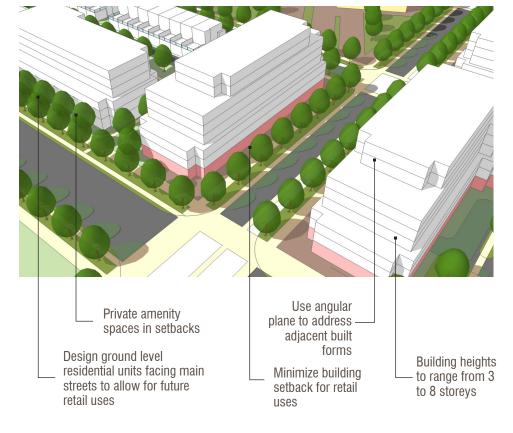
Demonstration plan illustrating some of the apartment and mixed-use building guidelines
